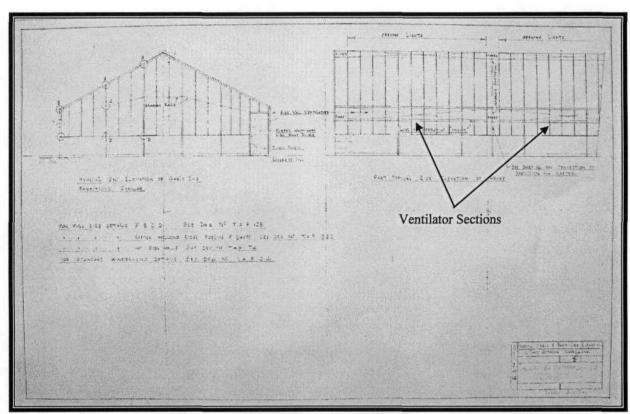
Elevations of greenhouses showing locations of ventilators (Fort Detrick Archival Collection 1954).
